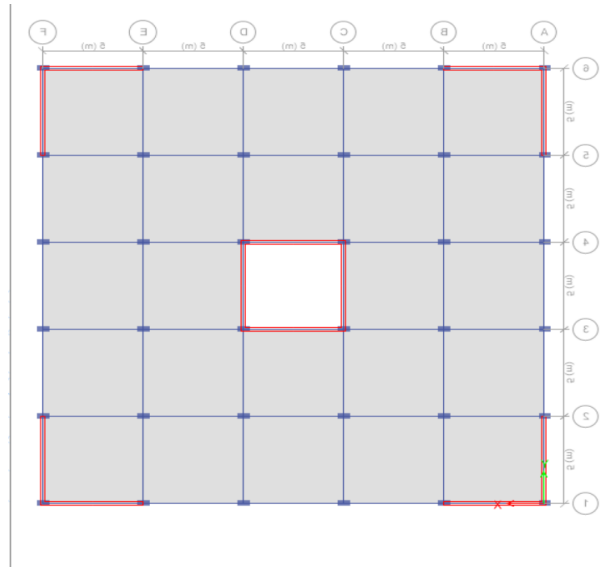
SYMMETRICAL BUILDING WITH SHEAR WALL
